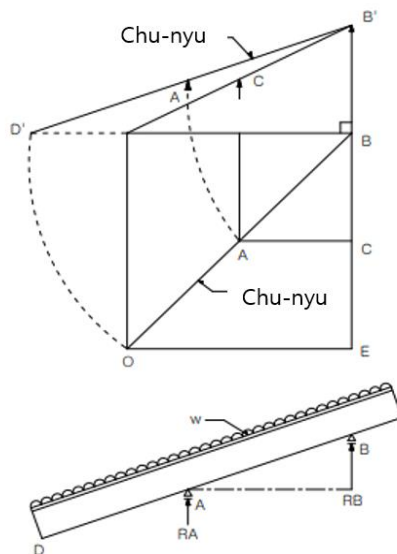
The slope of a roof and structural points of Chu-nyu
